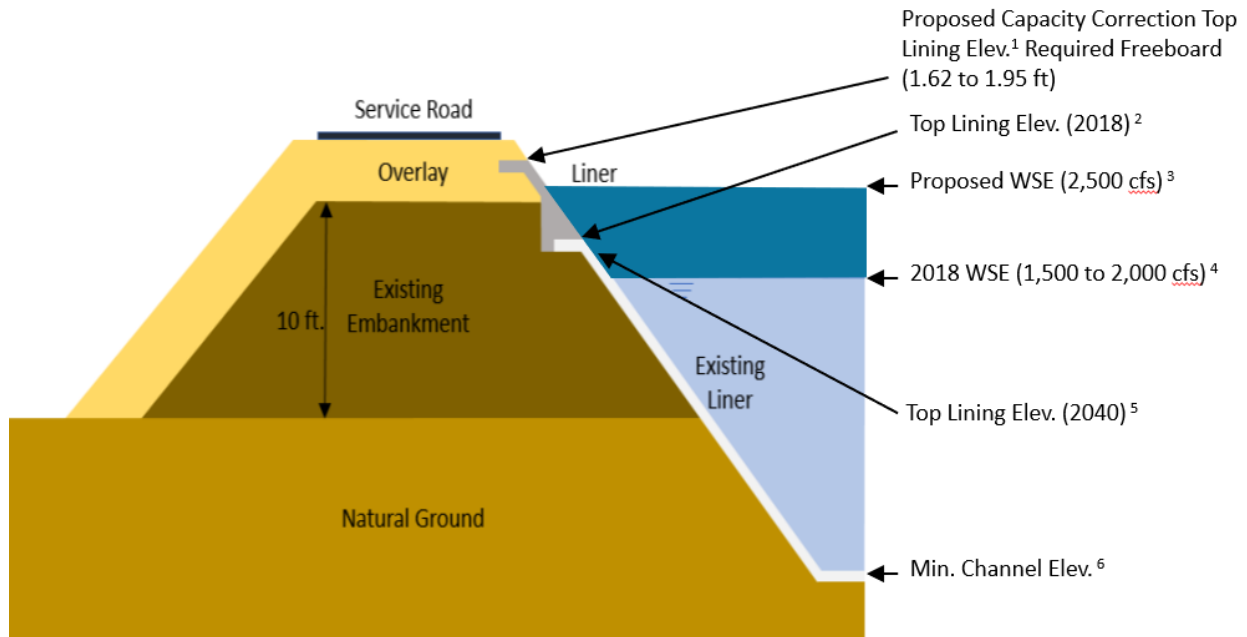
FKC Typical Detail for Embankment Liner Raise (Modified from FWA 2022)
